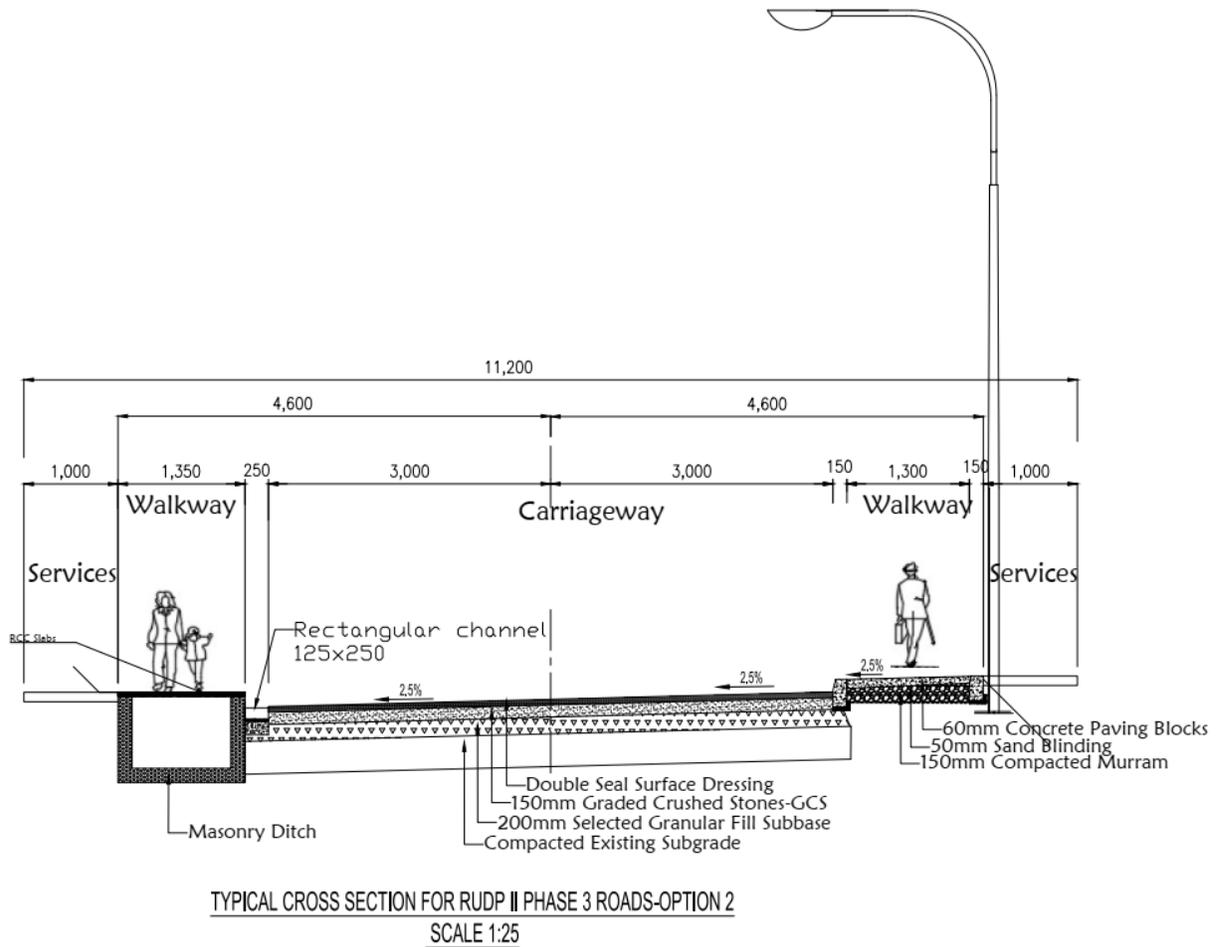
3: Typical Street Cross Section Option 2 (width 10.00m)
